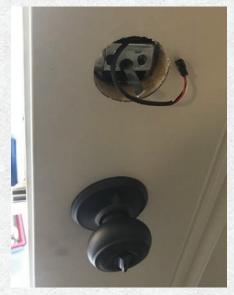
The wires are extended through the cross-bore hole sticking out on the inside of the door.
